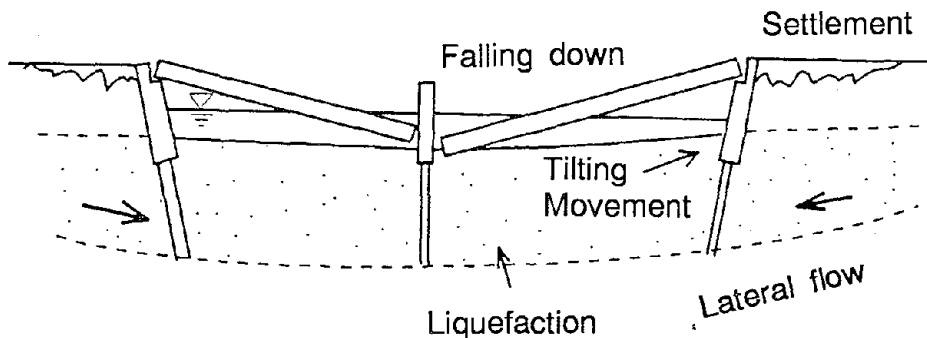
Mechanism of the damage of bridge due to lateral flow of the river bank
